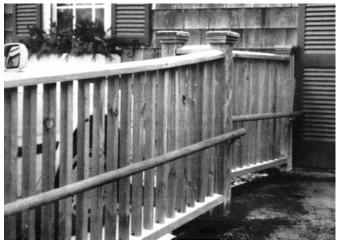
A second handrail installed at a lower height makes it easier for those in wheelchairs to pull themselves up an access ramp. For wheelchair use, the slope of a ramp should not exceed one in twelve.
